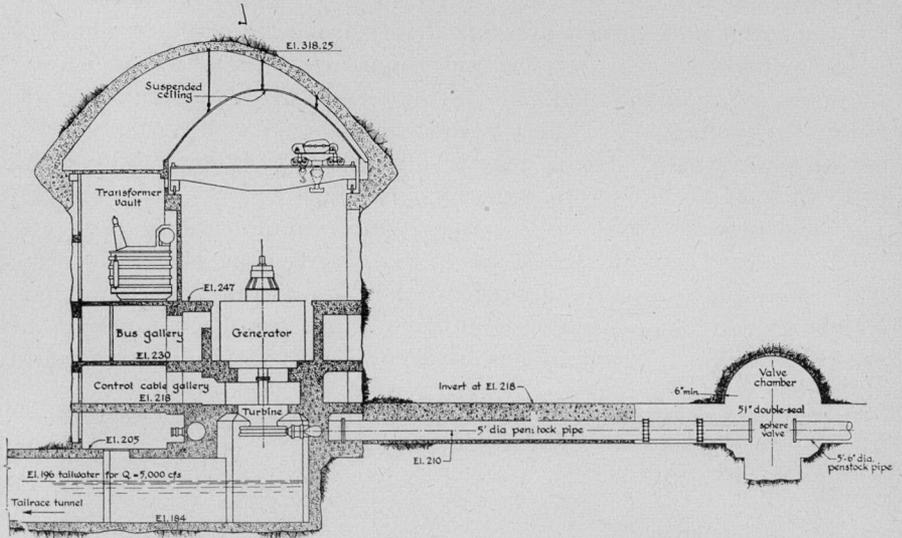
CROSS-SECTION OF POWERHOUSE ON UNIT CENTER-LINE.
